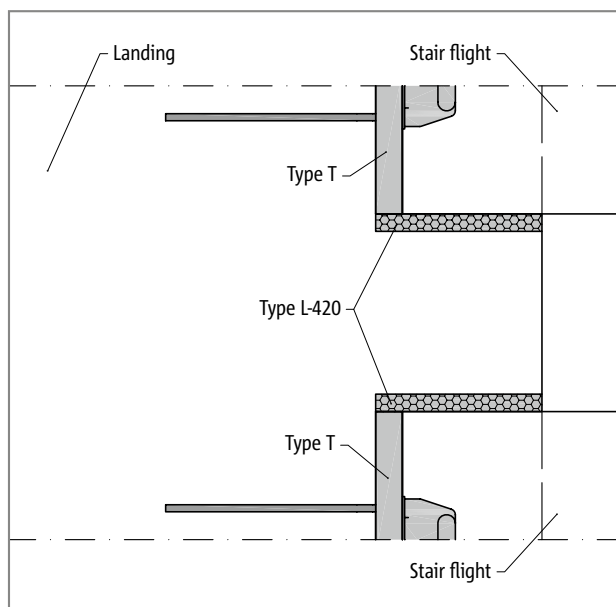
Schöck Tronsole® type T: Element configuration Detail A
